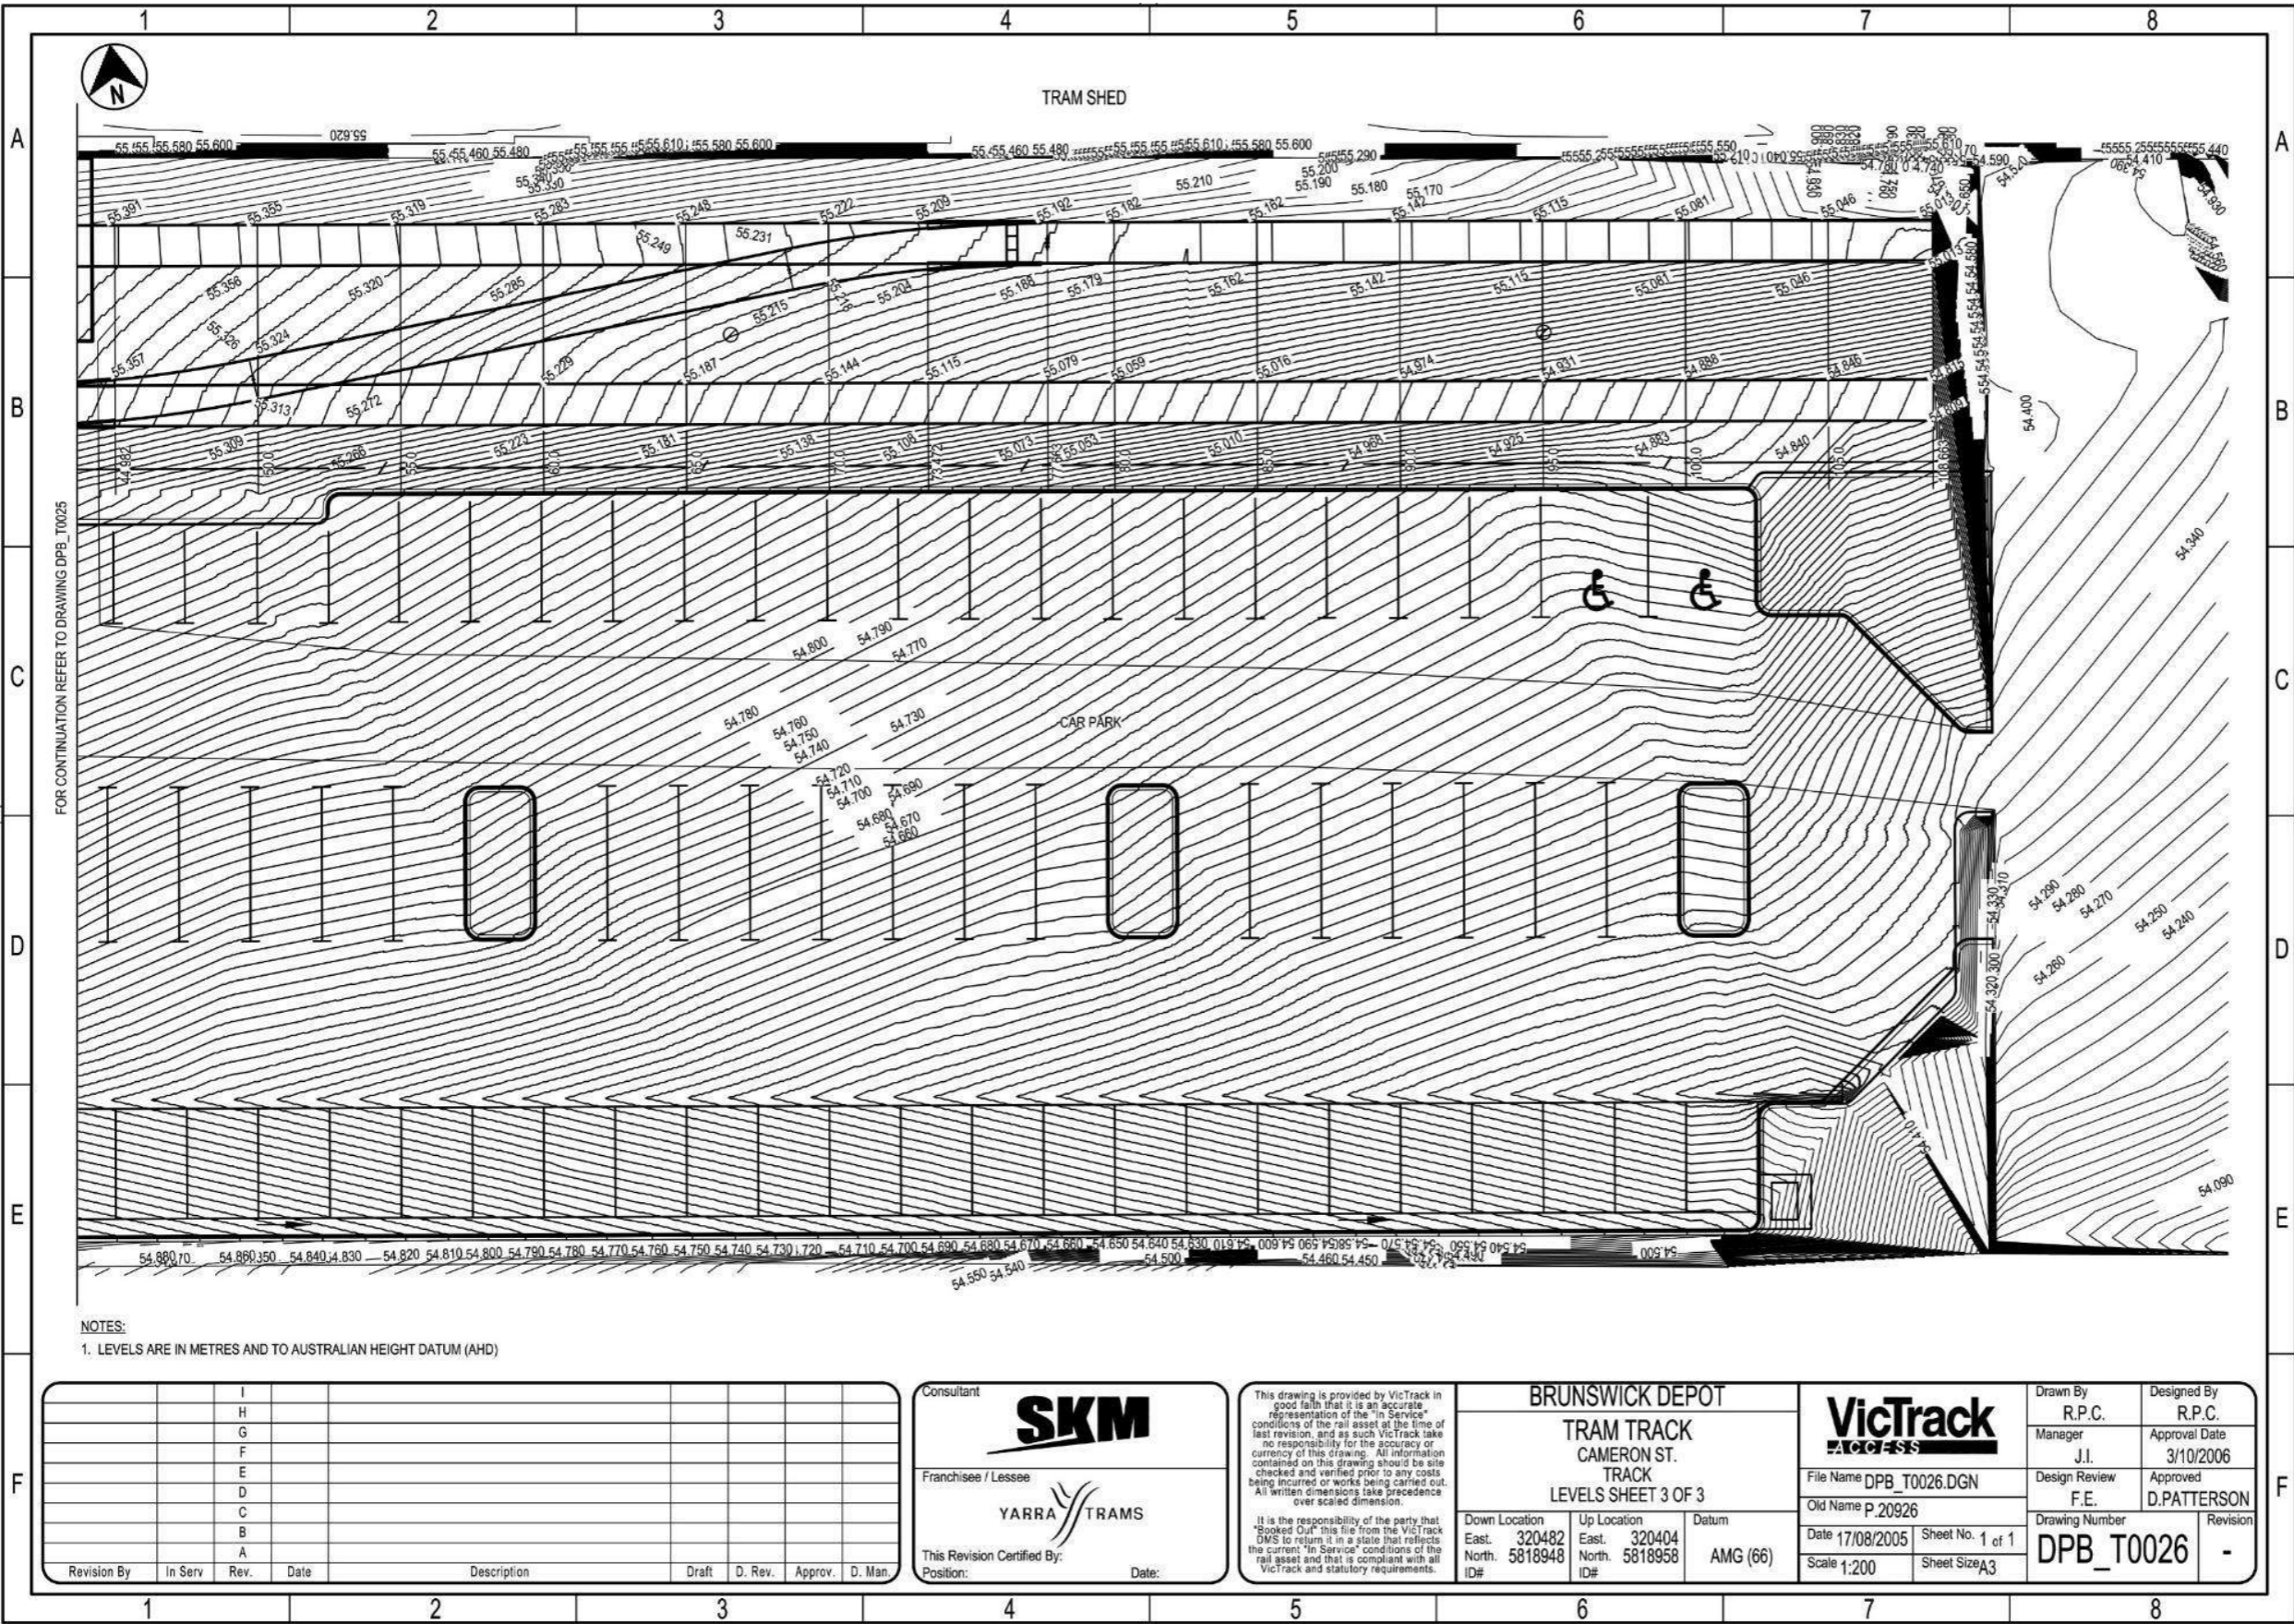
Detail of the 2006 VicTrack technical drawing of the carpark behind the Traffic and Revenue office building, showing the contour levels of the carpark and behind the Traffic and Revenue office
